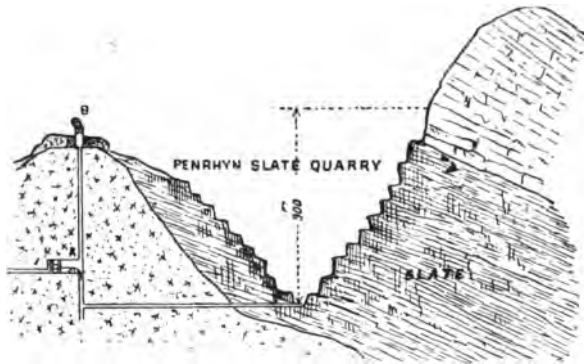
Section of quarry and shafts A, Hydraulic pumping-engine; B, winding machinery.
